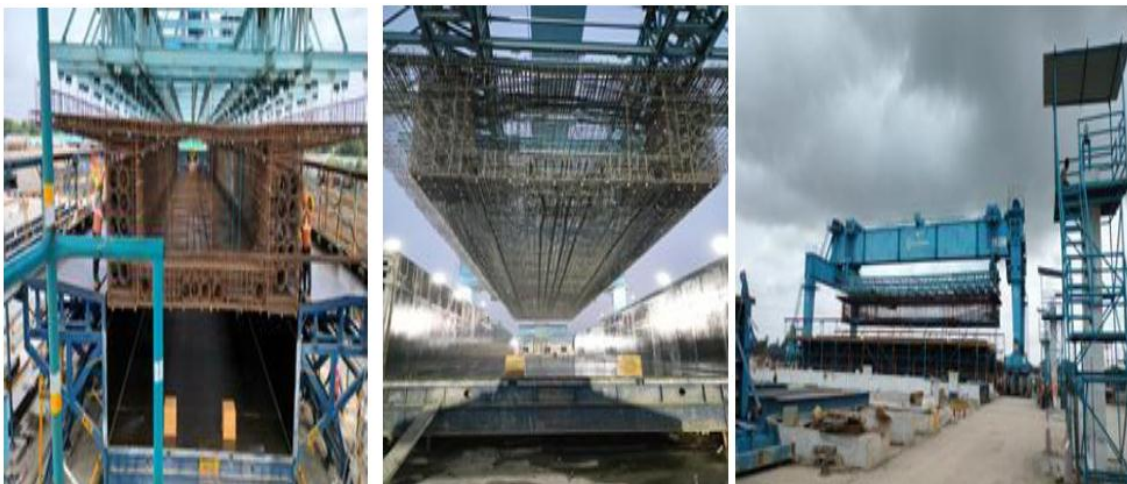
Rebar cage placing in casting mould with stiffener truss attached to Straddle carrier
